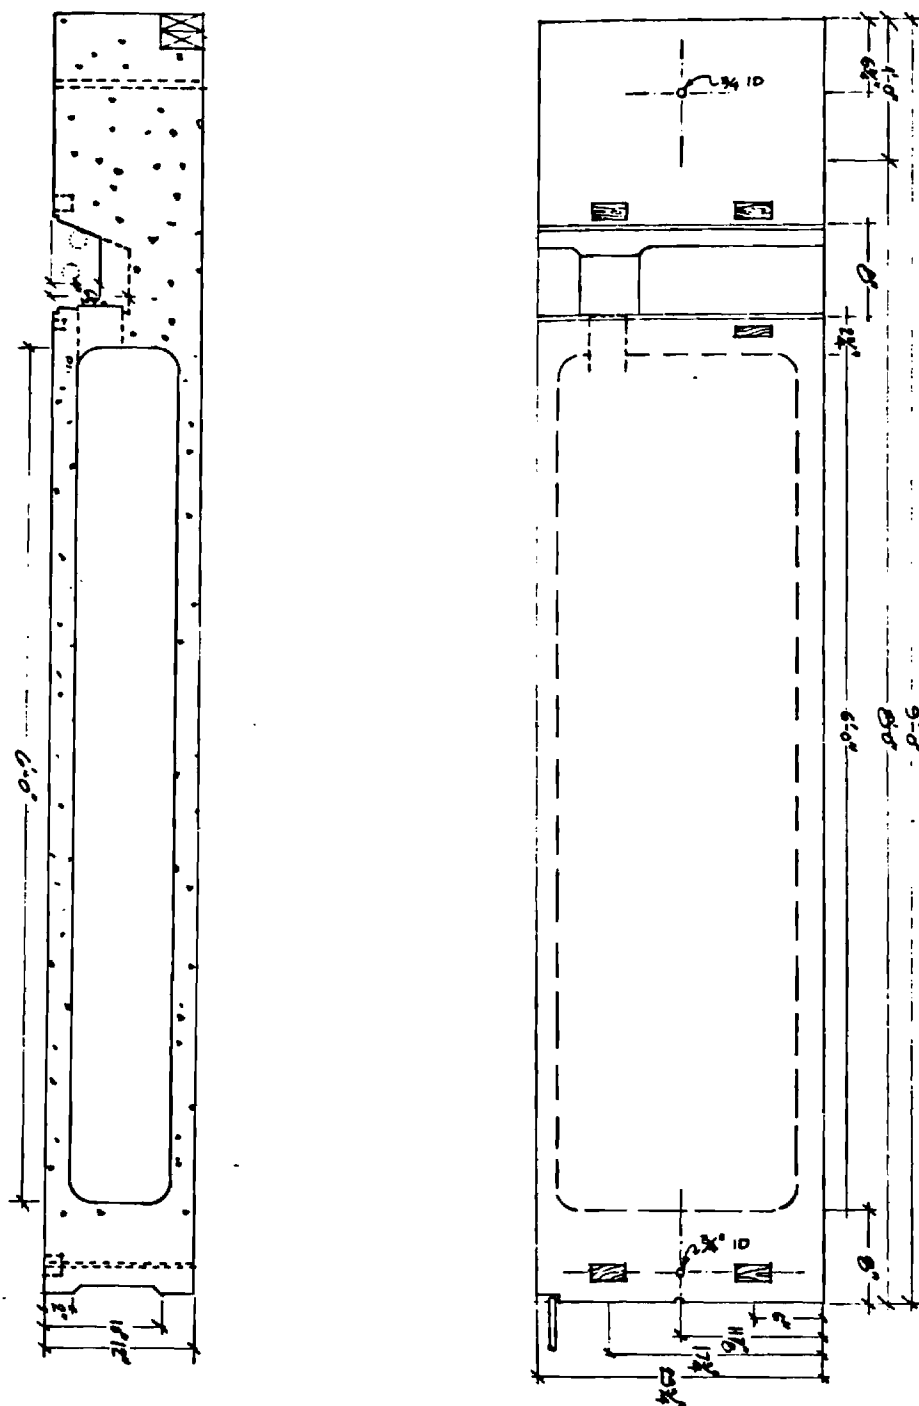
Section and Front Elevation of Cooling Wall Panels
